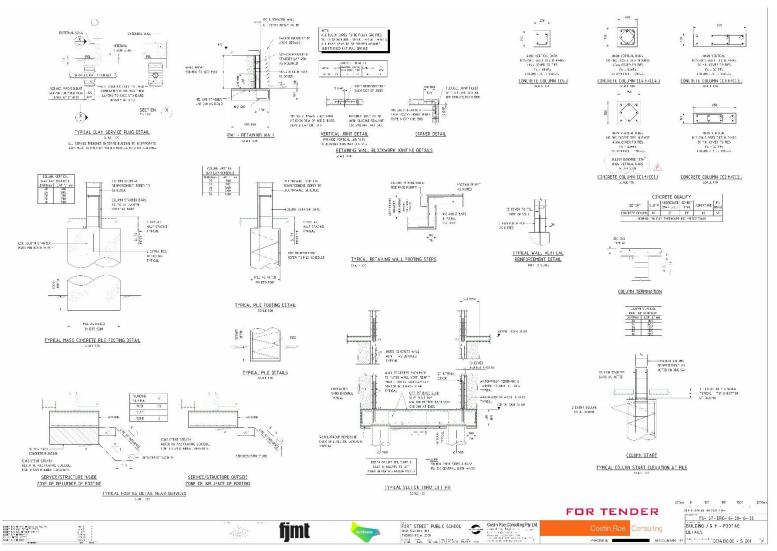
Details of piles and columns and section of lift pit in Building J. (Source: Lendlease, 2021)
